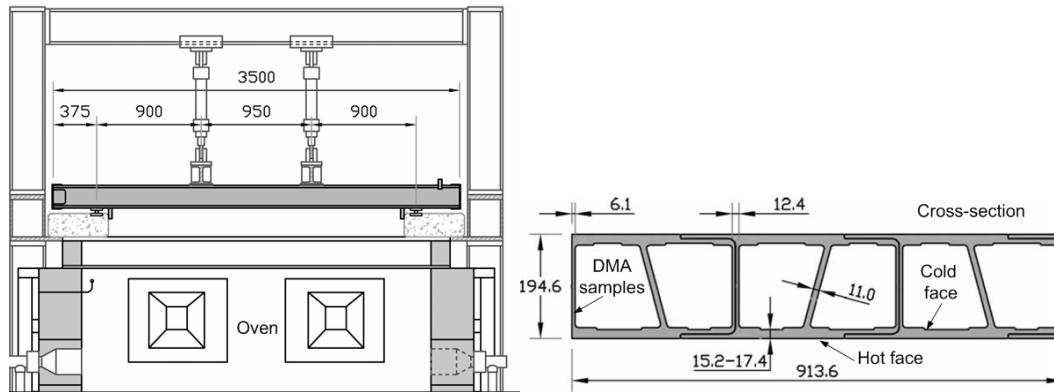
Experimental setup and specimen cross-section for three full-scale GFRP slab specimens.
